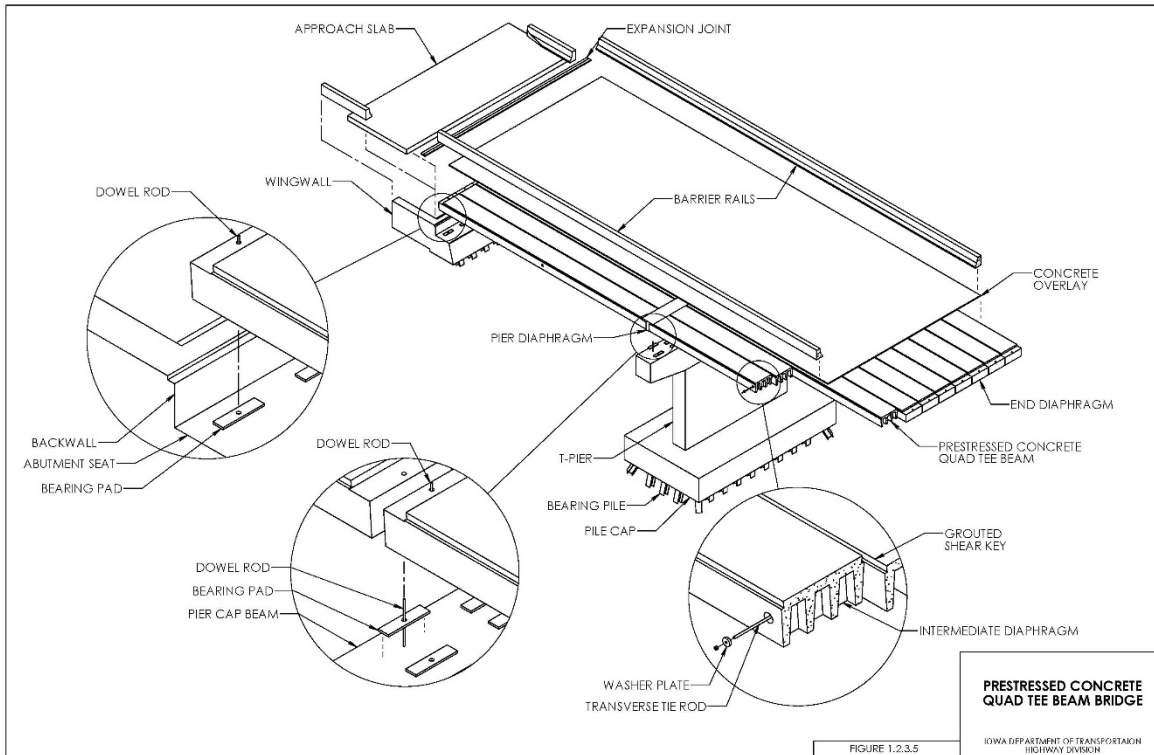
Prestressed Concrete Quad Tee Beam Bridge Components
